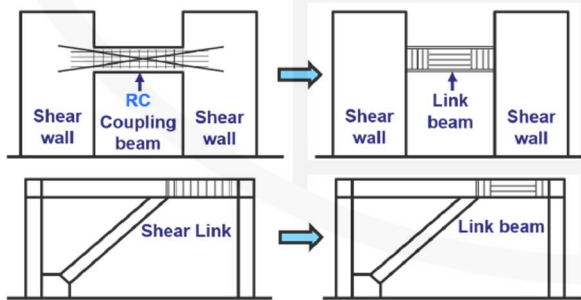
Schematic diagram of an RC connecting beam and eccentric diagonal bracing shear link replaced by a connecting rod beam.
